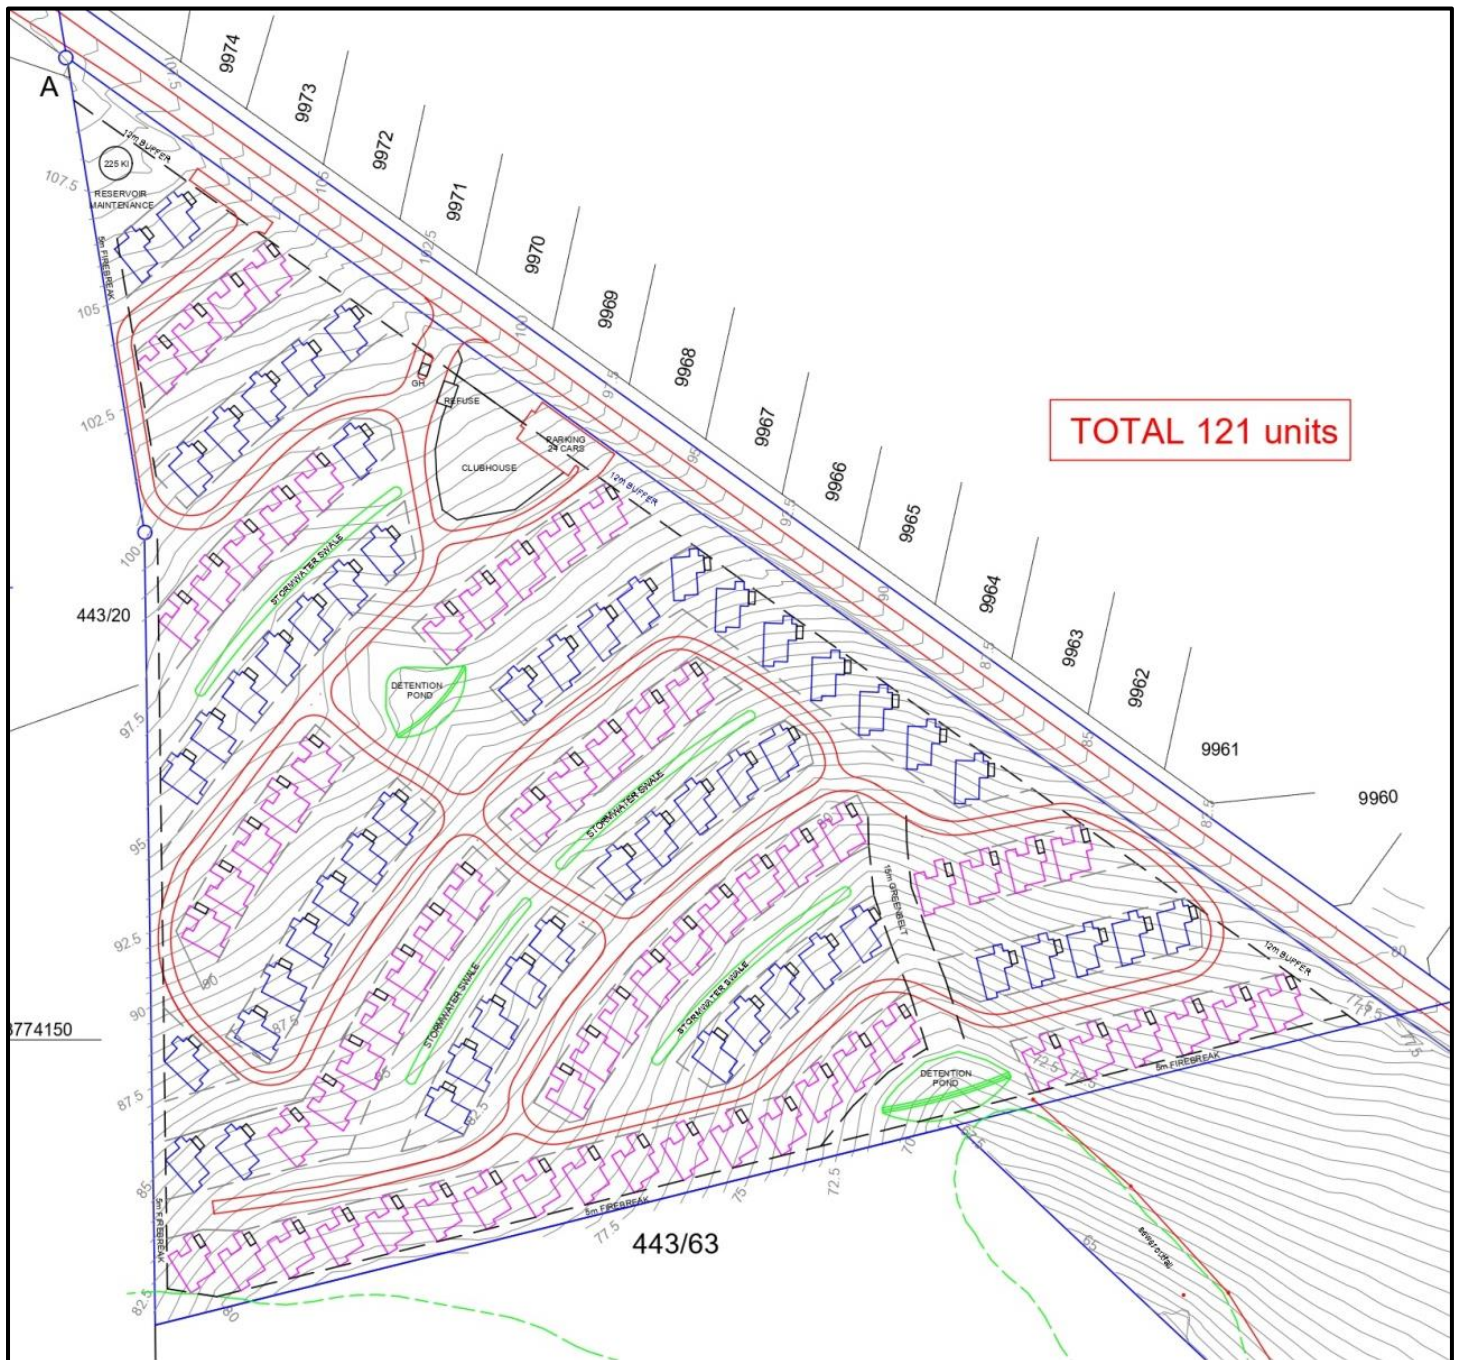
Site development plan (SDP) of the proposed Sectional Title Retirement Complex over the residential footprint.
